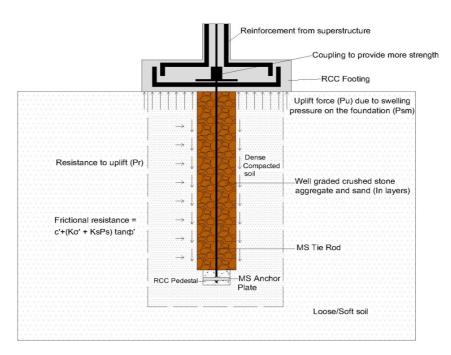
A Granular Pile Anchor Foundation (GPAF) System
